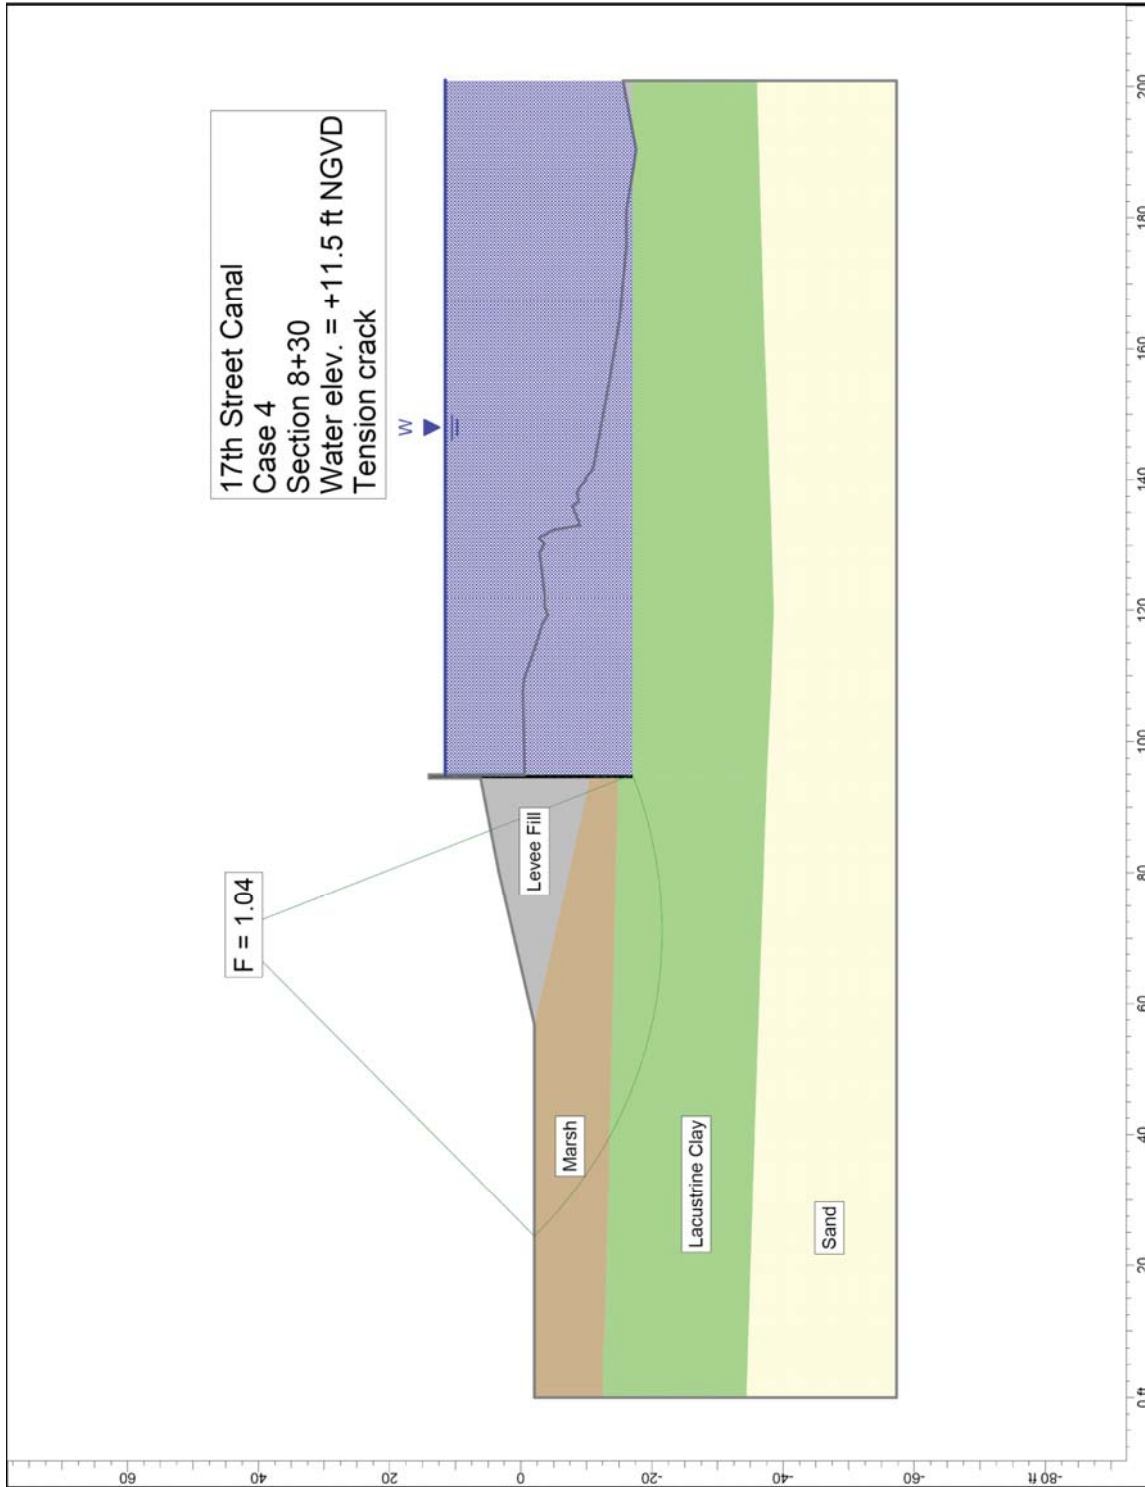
Critical circle for 17th Street Canal Station 8+30 – water elevation 11.5 ft, tension crack.
